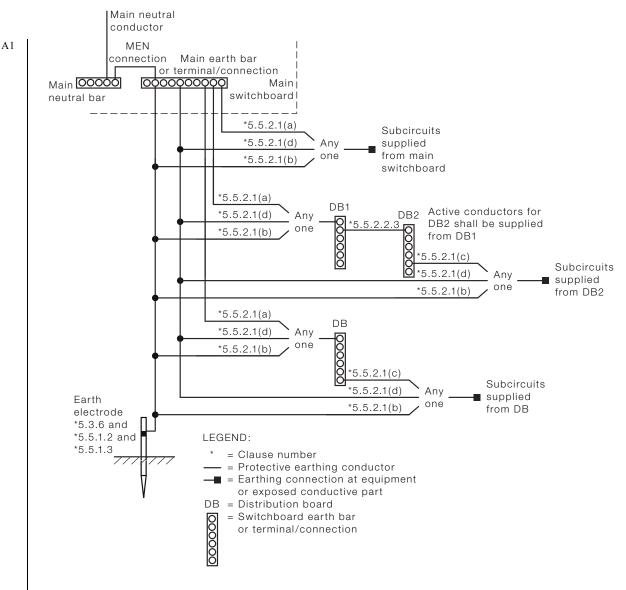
EXAMPLES OF EARTHING ARRANGEMENTS (CLAUSES 5.5.2.1 AND 5.5.2.2.3)
